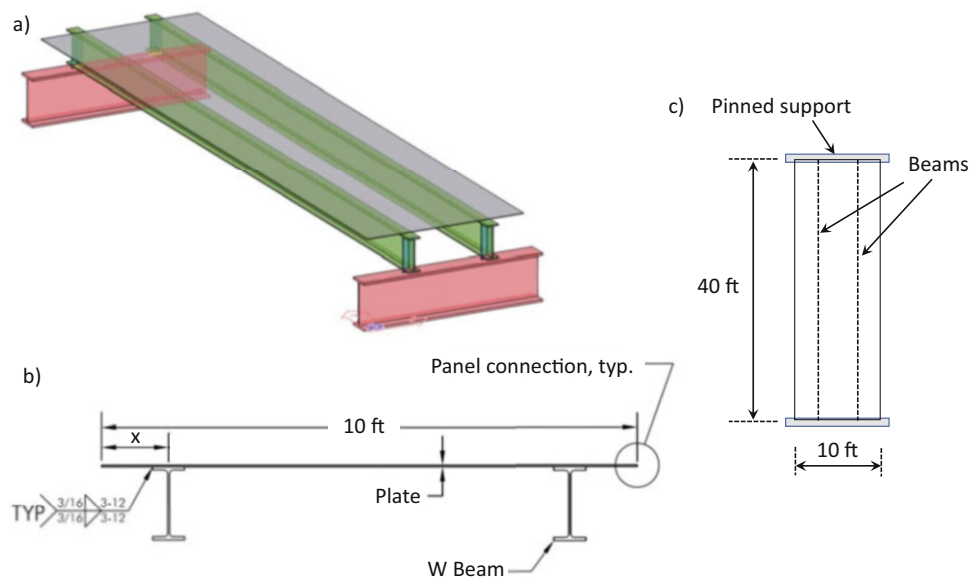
Modular steel plate assembly – single module. (a) 3D view, (b) cross-sectional view, and (c) plan view
